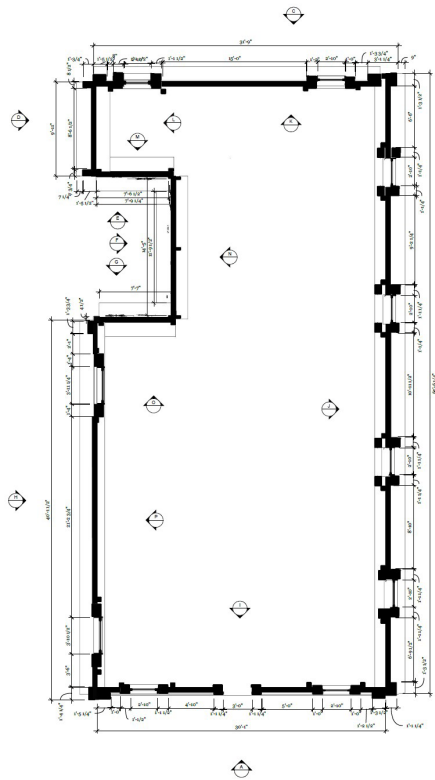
Henning's Sporting Goods, Ground Plan Drafting, SketchUp & Layout, Zach Zahn, 2022
